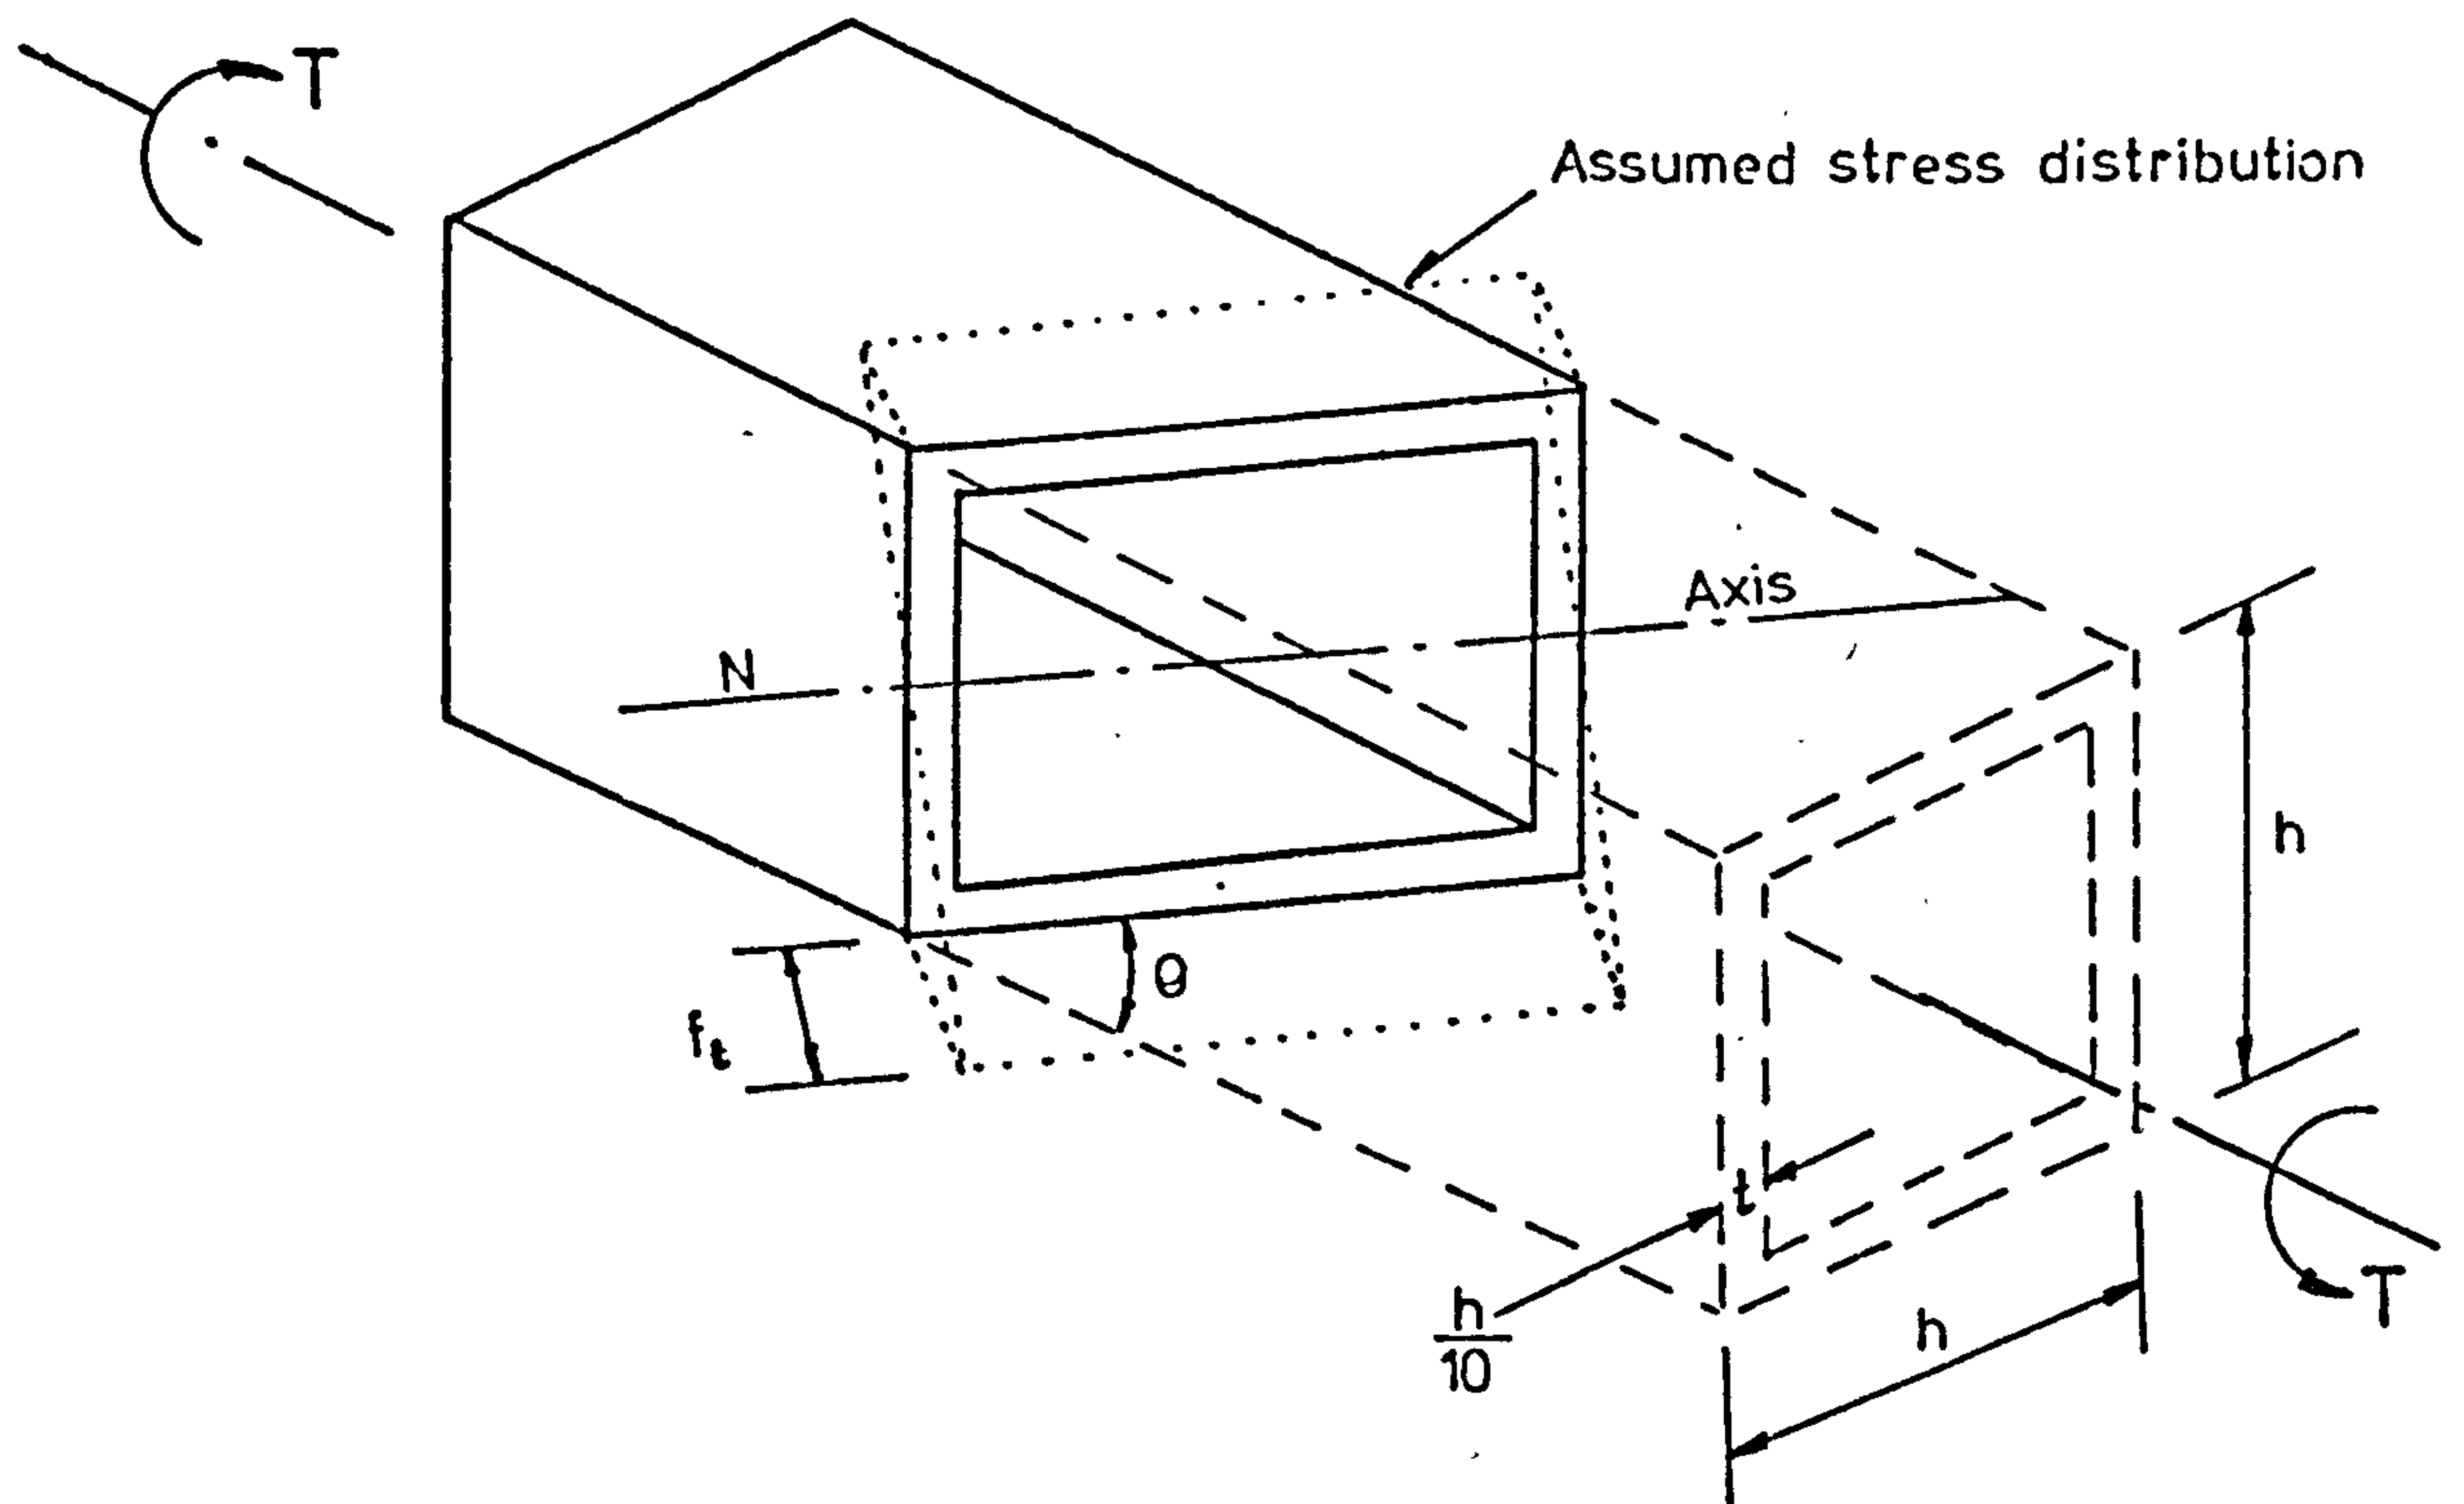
Assumed failure plane of a box-beam under pure torque (due to Hsu)
